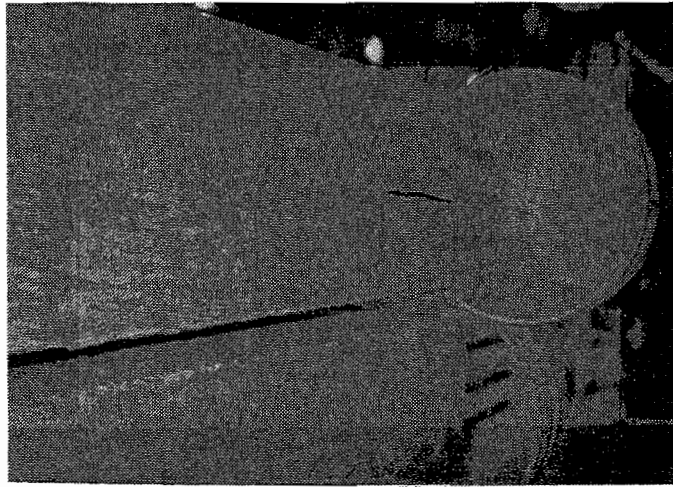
Photograph of Splitting Crack, Beam FR360-1A, Before Testing
